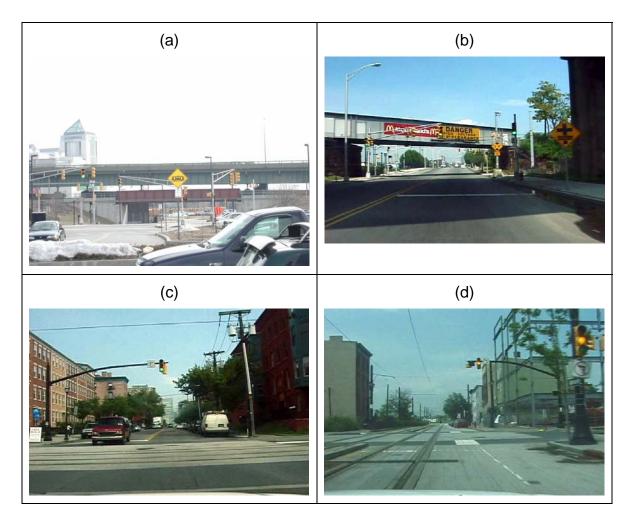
Traffic control devices and roadway layout at light rail crossings: (a) light rail warning sign and traffic signal lights, (b) warning sign showing roadway parallel rail tracks, (c) light rail tracks at crossing, (d) two-way, single-lane road shared by light rail trains and automobiles.
